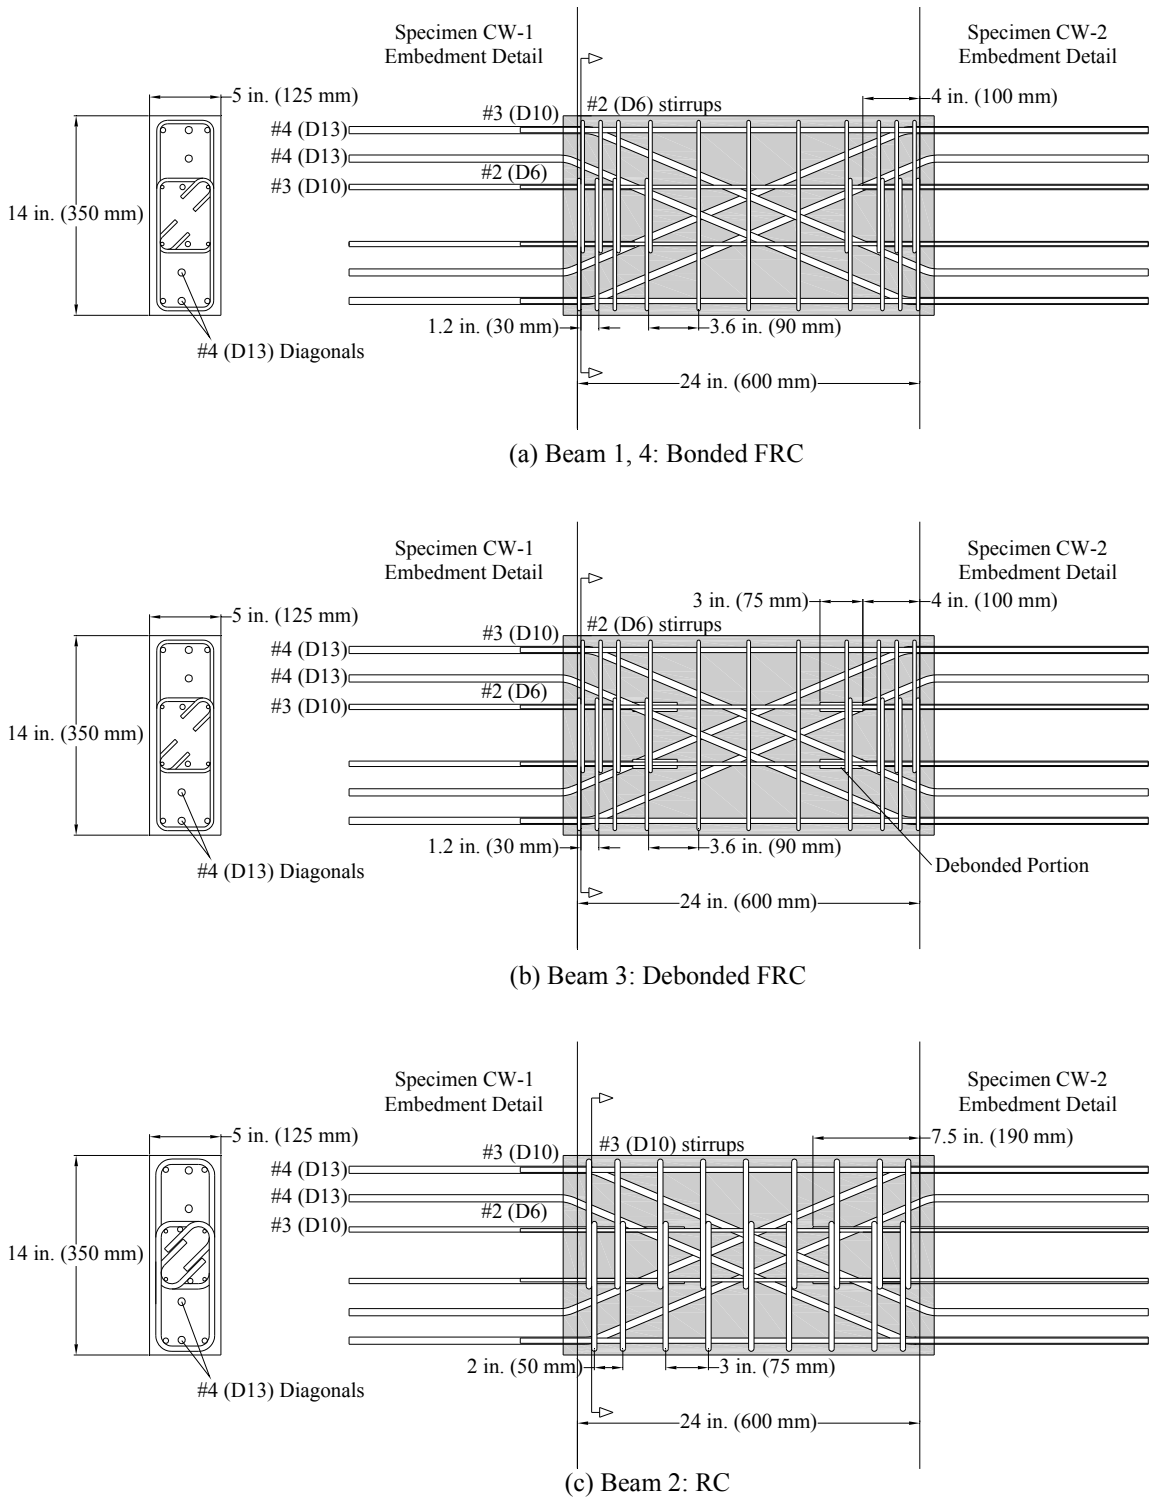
Coupling beam reinforcement (as shown on left, longitudinal reinforcement was cutoff near the wall face in Specimen CW-1. All longitudinal bars were fully developed in Specimen CW-2)
